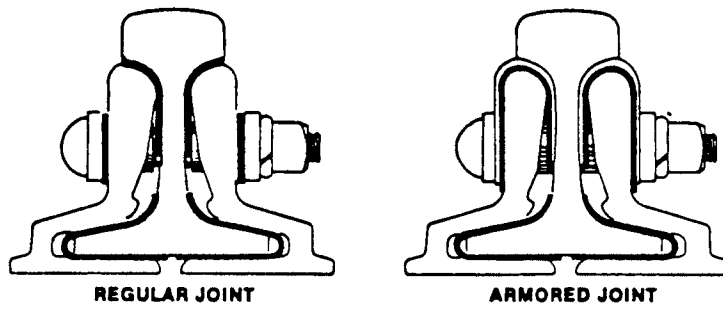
CROSS SECTIONAL VIEW OF AN INSULATED JOINT
